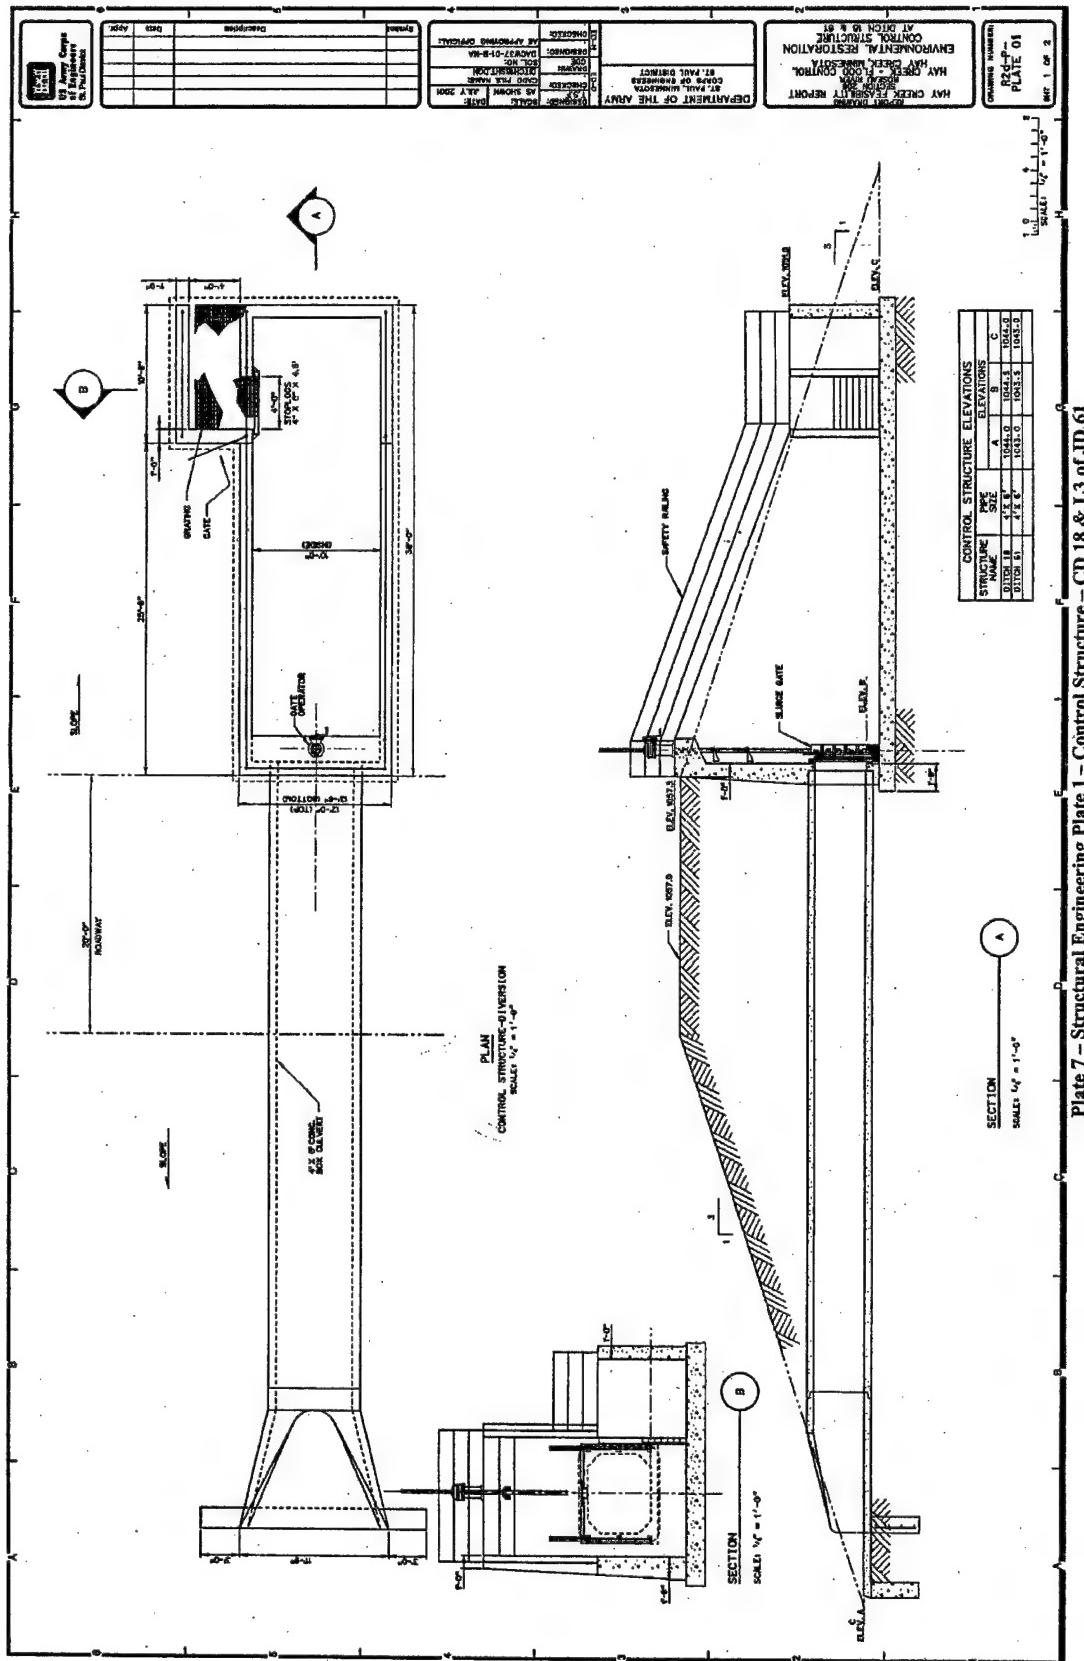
Structural Engineering Plate 1 - Control Structure - CD 18 & L3 of JD 61
